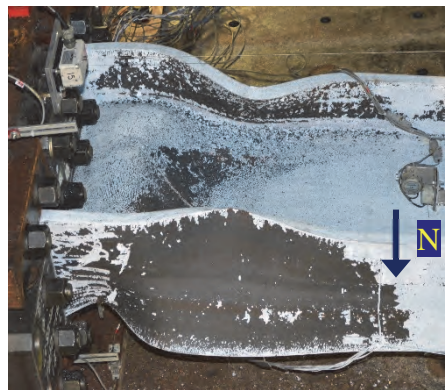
Specimen 11M: Column Fracture at End of Test (Northeast Flange)
